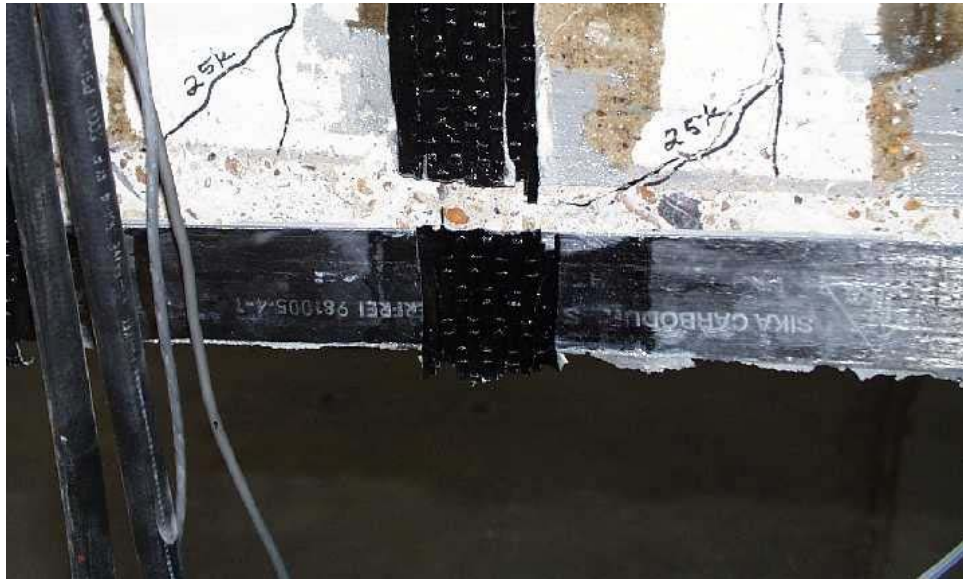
Debonding Failure with Strap Rupture for Specimens with Side Application with Straps
